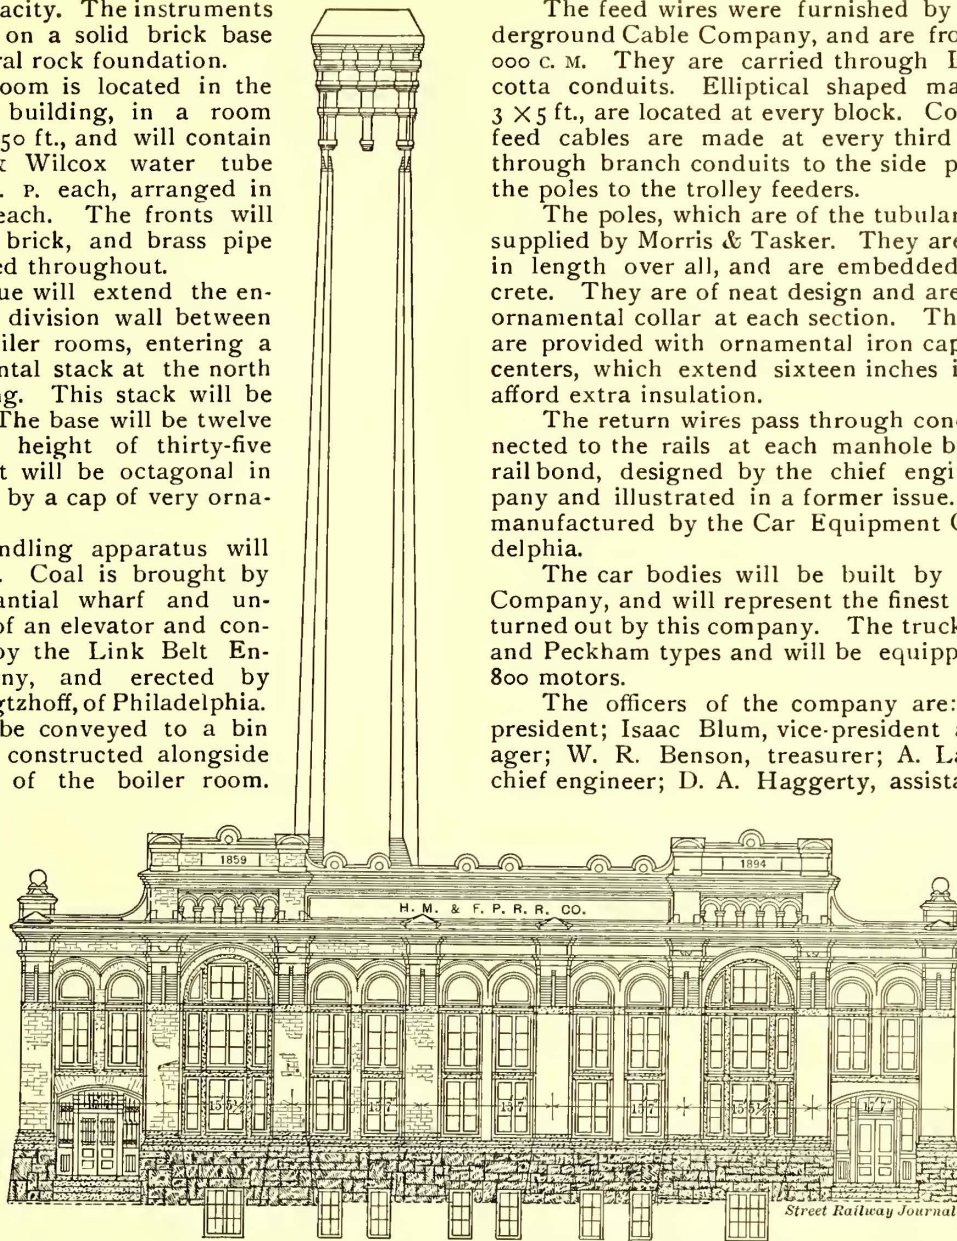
FRONT ELEVATION OF POWER STATION—HESTONVILLE, MANTUA & FAIRMOUNT PASSENGER RAILWAY CO., PHILADELPHIA.
